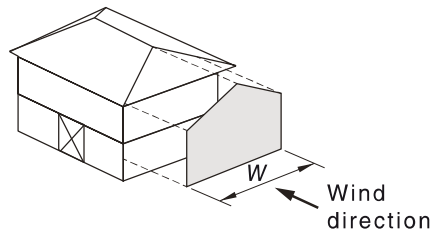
END ELEVATION—LOWER STOREY OF TWO STOREYS—HIP-ENDED ROOF
